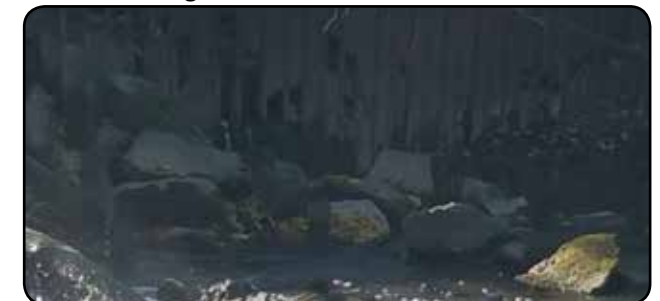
| Failing Sheet Piling on Deep River Dam
